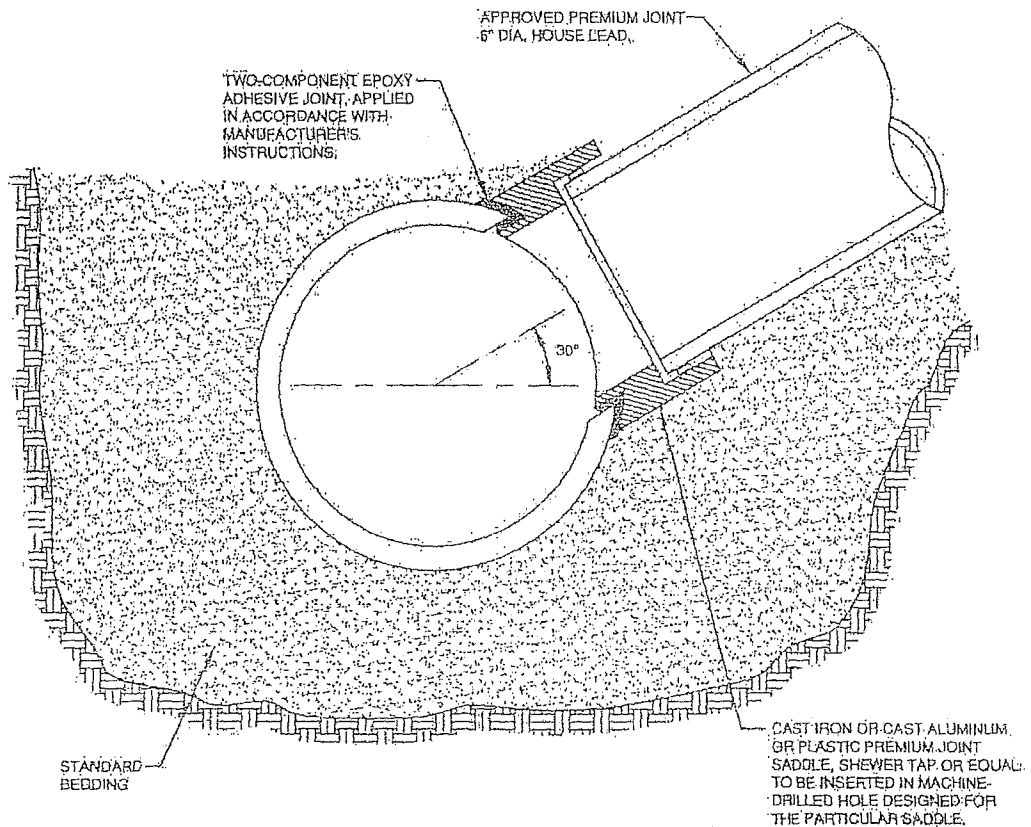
DETAILS OF HOUSE LEAD CONNECTIONS TO MAIN SEWER WHERE WYE OPENINGS ARE NOT PROVIDED
